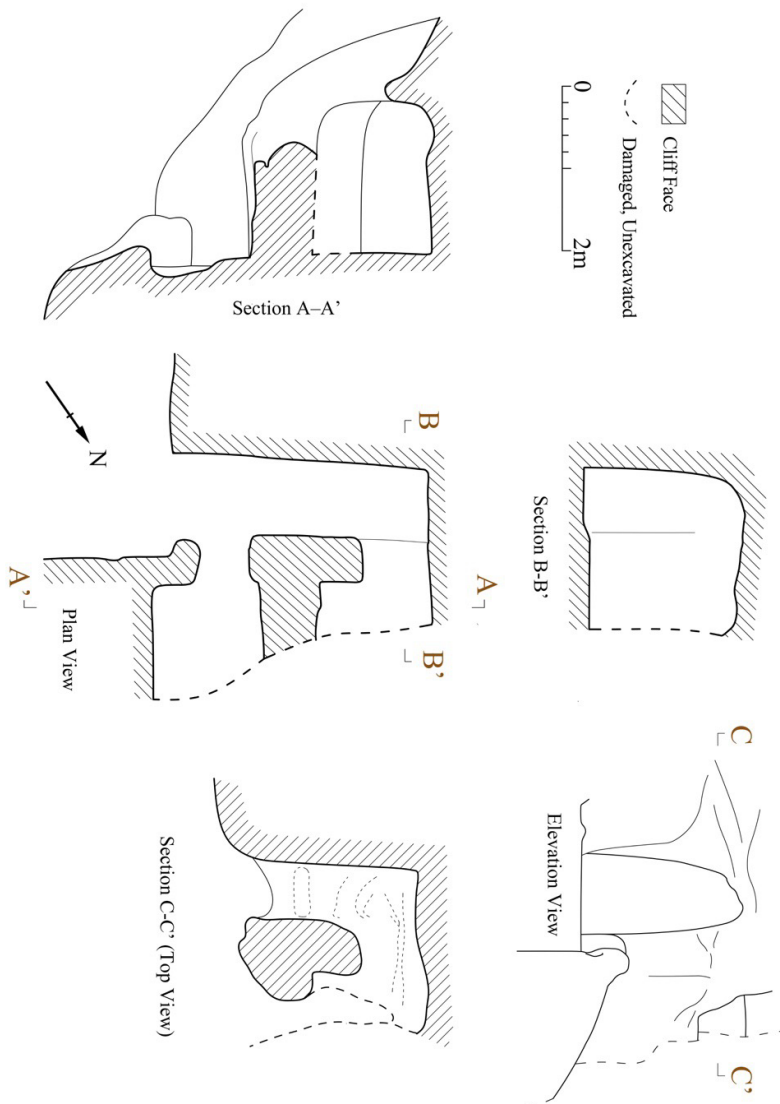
Plan, elevation, and section of K24-3 (Drawings by the authors).
